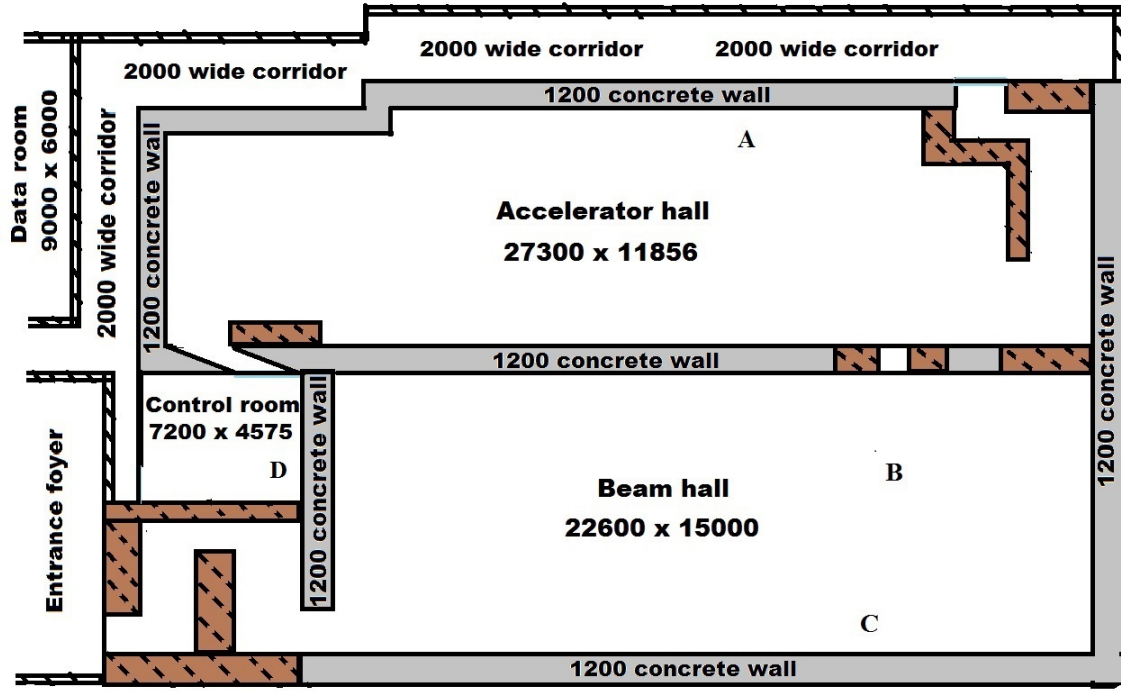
The schematic diagram of the FRENA building ground floor. A, B, C, and D are the locations of measurements. The boundaries with no hatched lines are permanent concrete shielding walls, and the hatched line ones are the temporary shielding walls. All measurements are shown in mm.
